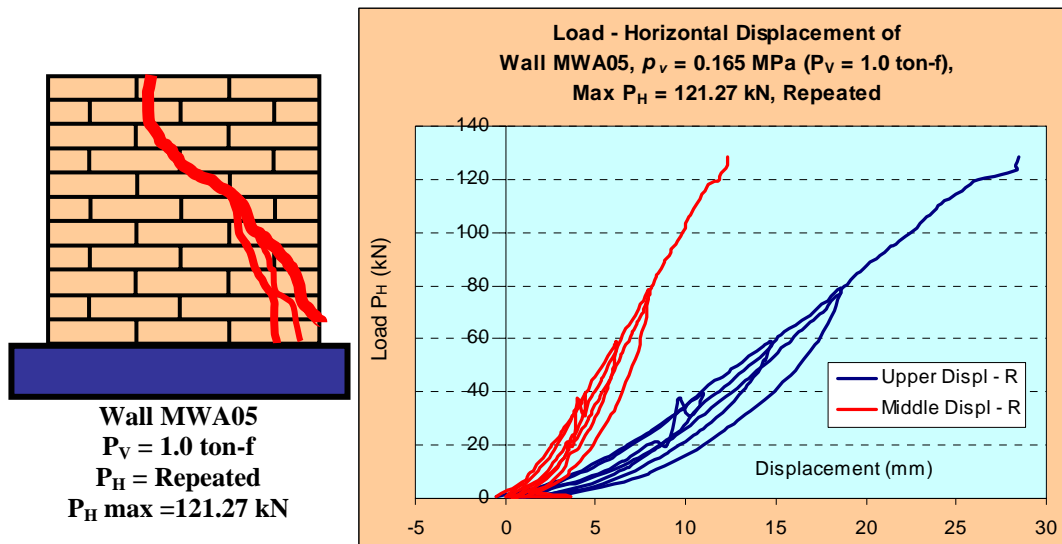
Failure pattern and load-displacement of wall MWA05
